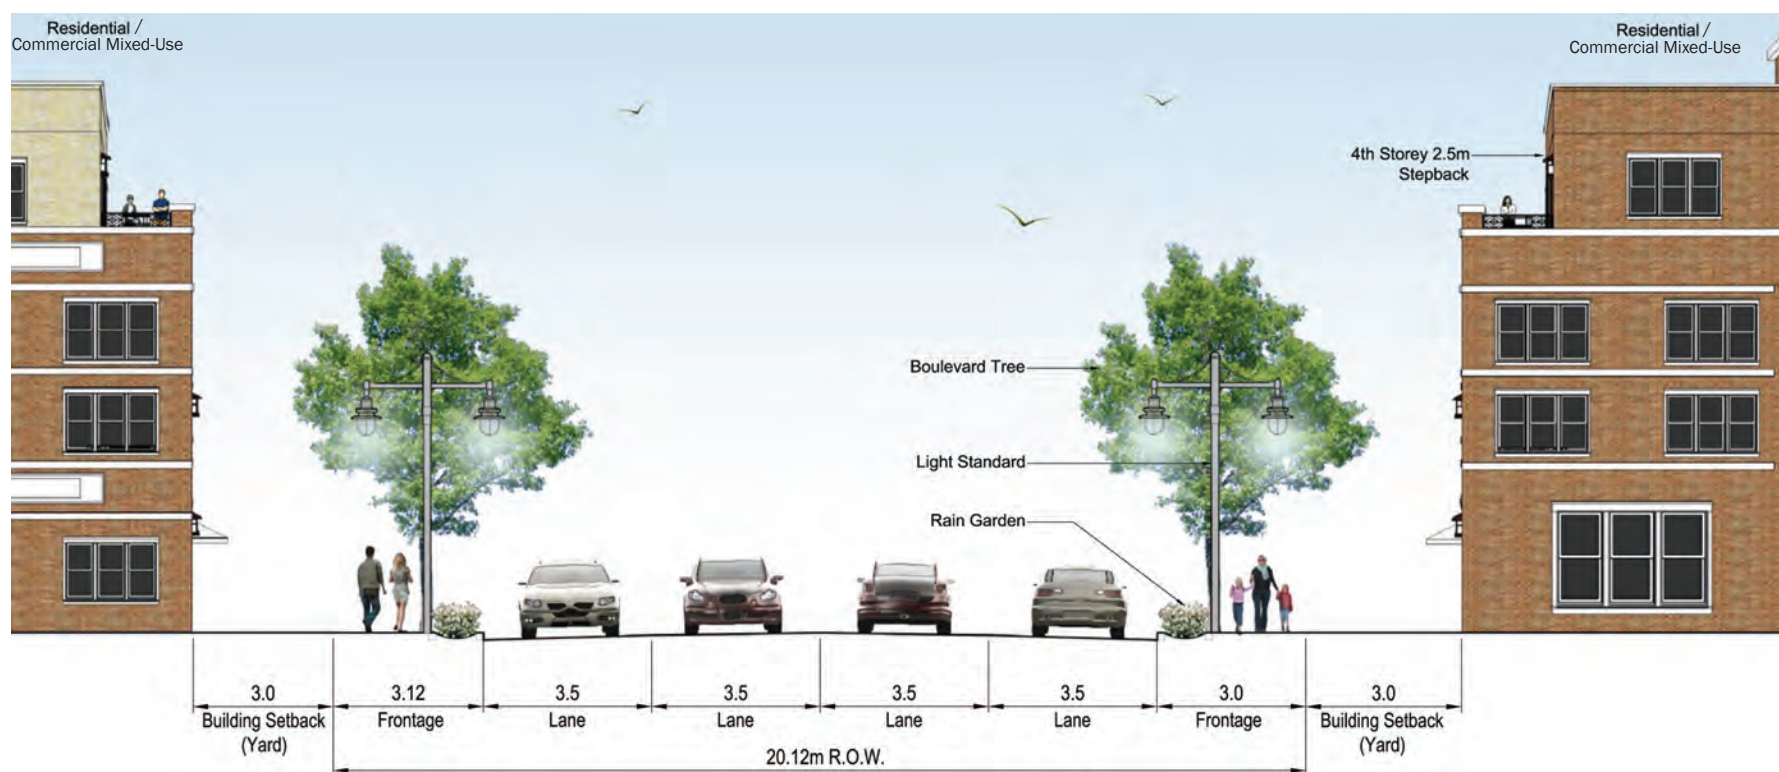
Proposed 50<sup>th</sup> Street Enhancements
